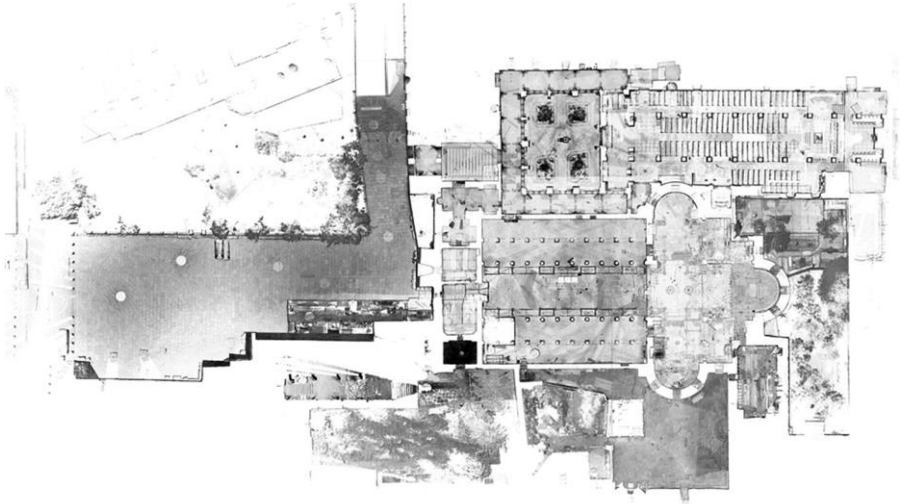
Planimetric view of the point cloud from laser scanner, sectioned on the ground floor.
